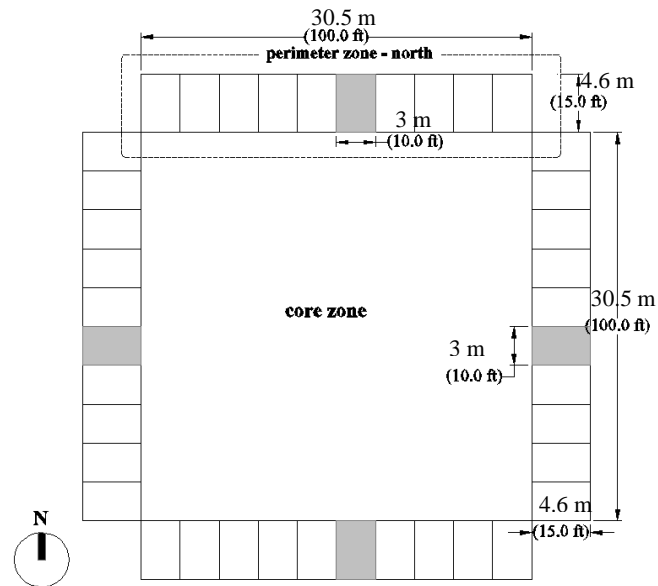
Square floor plan building of 1,487 m² (16,000 ft²).
